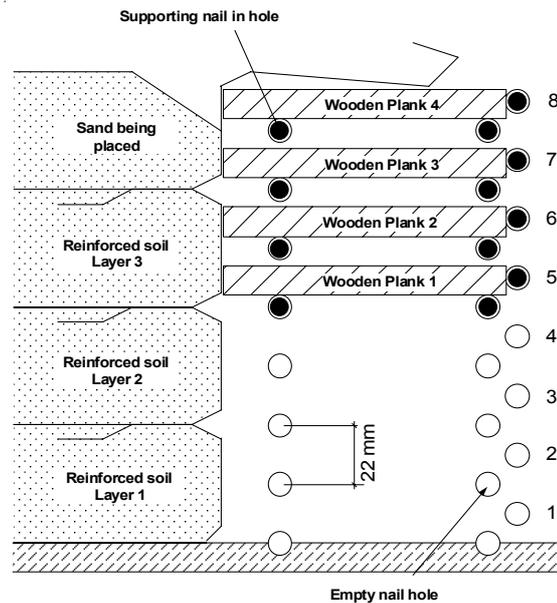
Cross section of the apparatus showing the reinforcement support system during construction of a reinforced soil wall. The front of apparatus is on the right hand side of the diagram.
